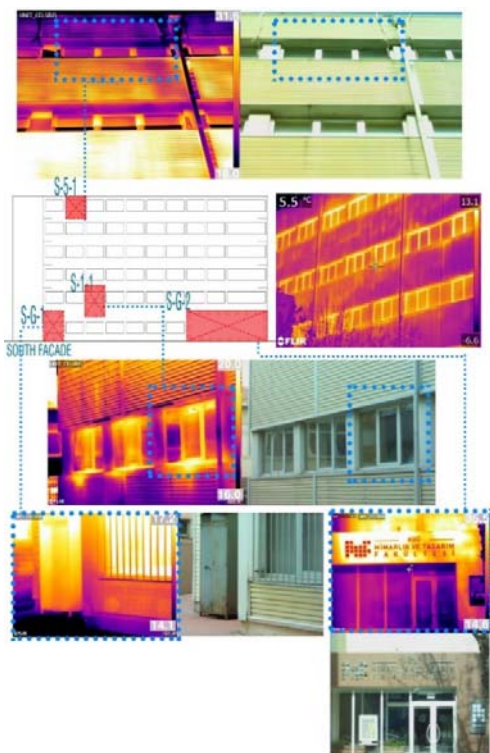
IRT captures on South Elevation of Faculty of Architecture and Design
